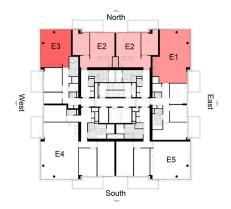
Double-sided zones facing North in "layout E" does not have operable windows on the north side, making them more prone to overheating.
